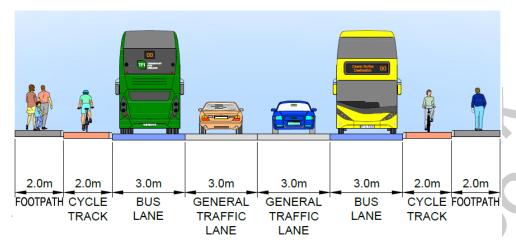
Section 1, Proposed Option 4 - Cross Section A-A
